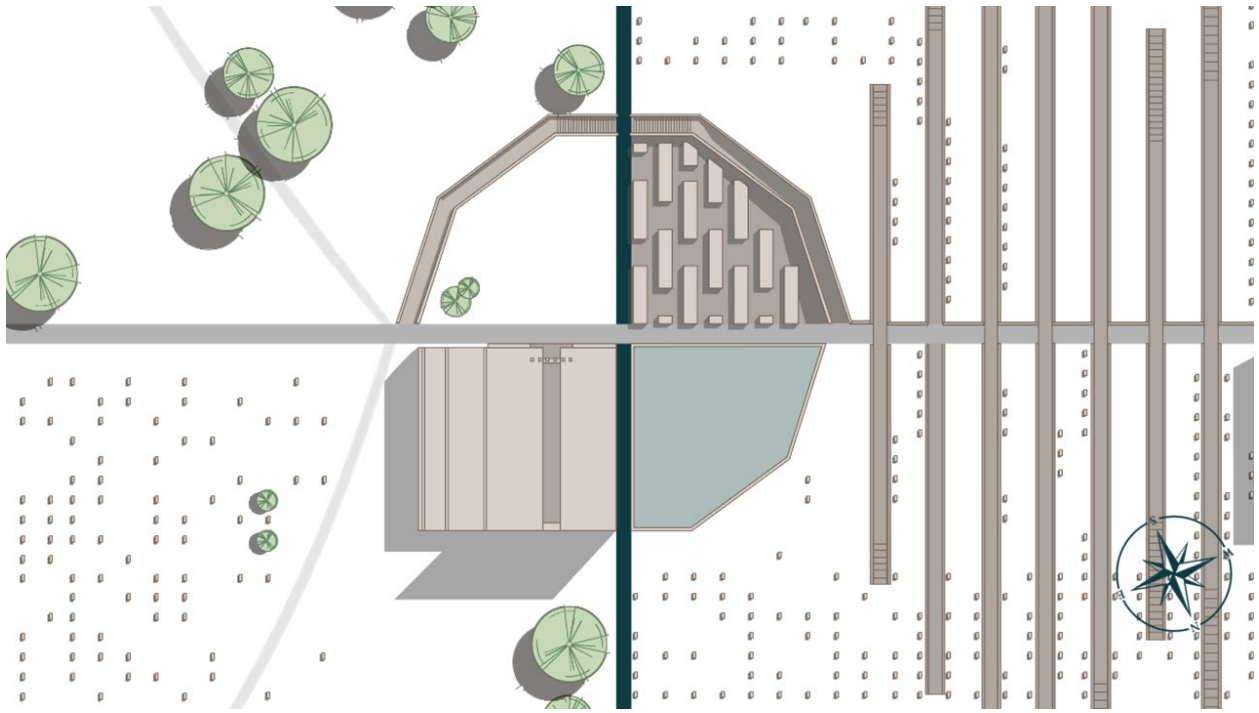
Mausoleum and Sanctum Site Plan
